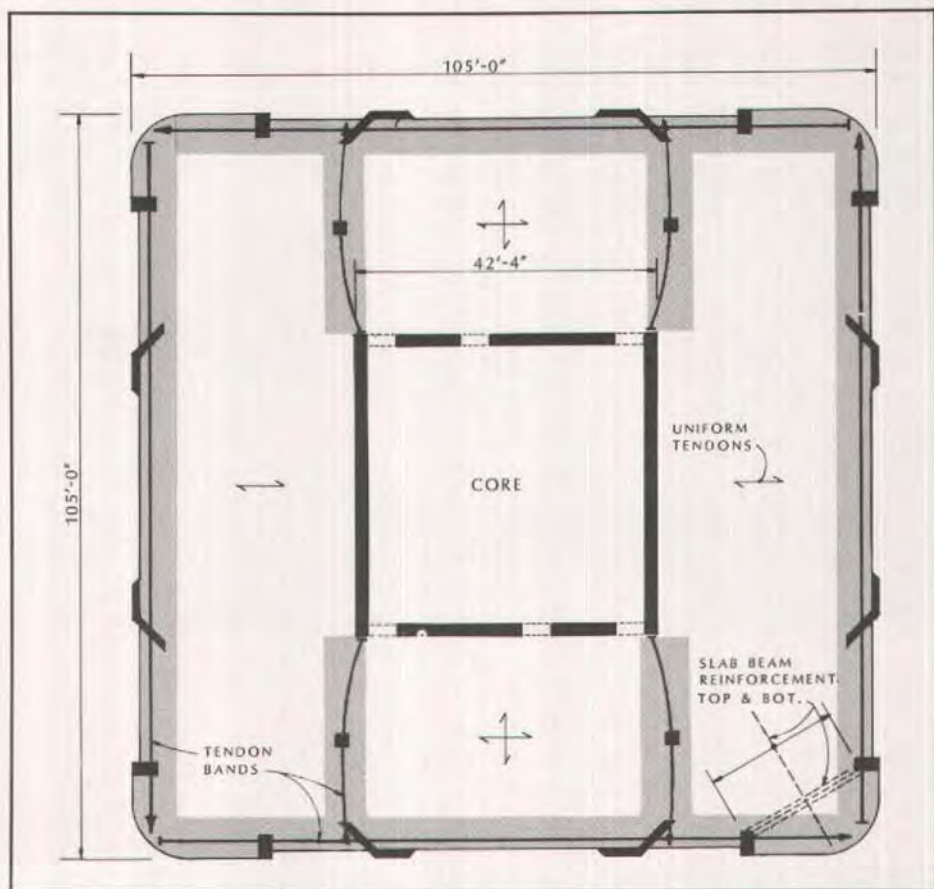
Typical structural floor plan (Parklane Plaza Condominium, Houston, Texas).
